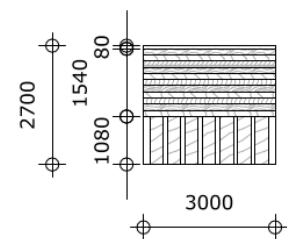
Side view cross-section direction stacking layout preliminary design in mm
